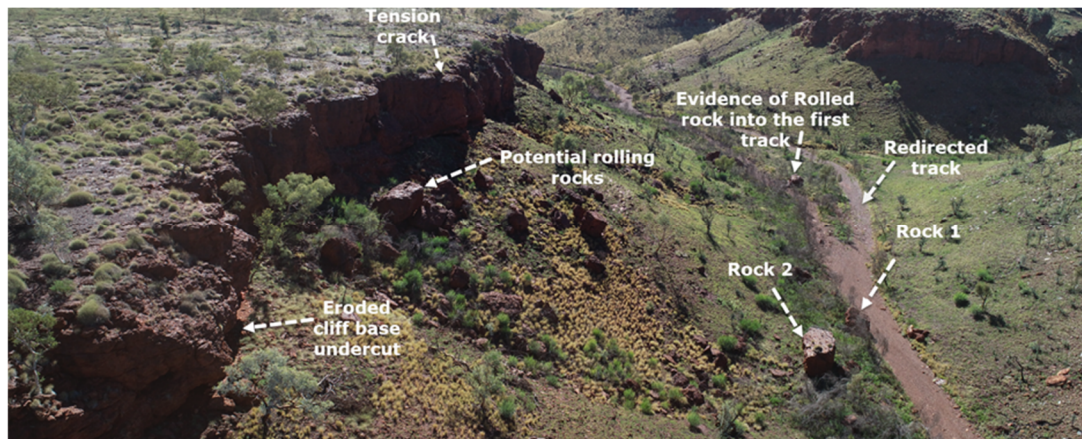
An aerial photograph of the slope and the walking track showing loose rocks from the facade used in rockfall simulation, behind a mining village in the Pilbara, Western Australia
